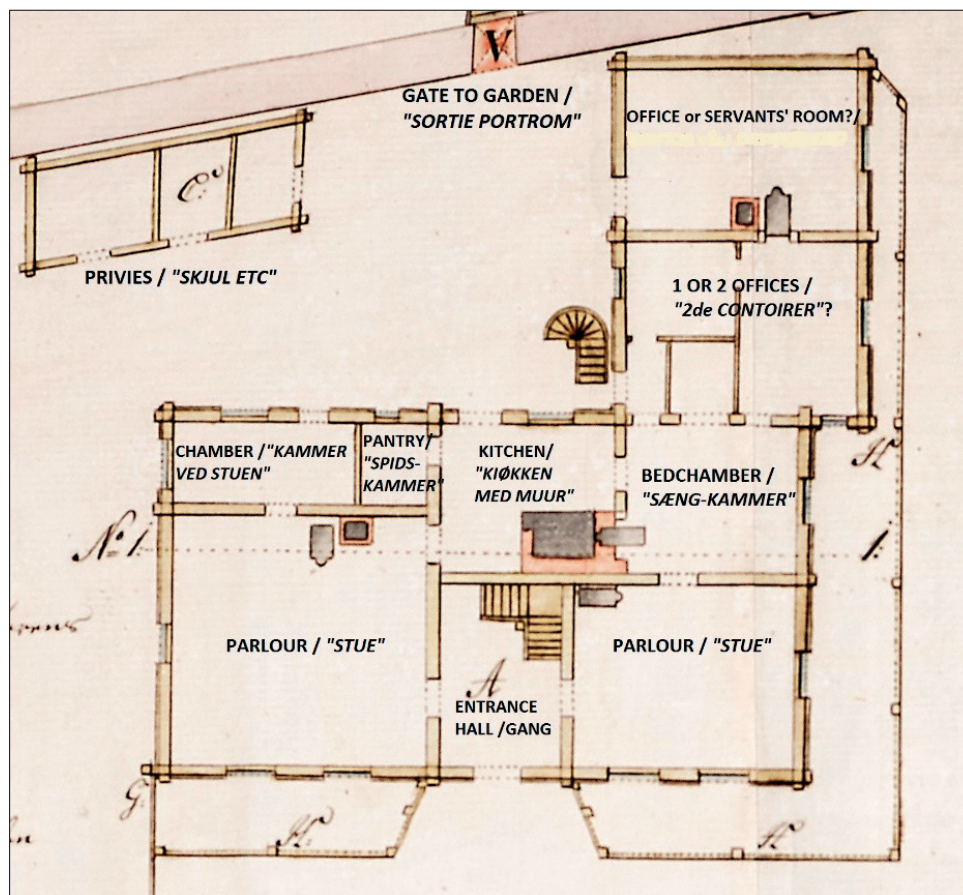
An interpretation of the ground-floor rooms (*1. etasje*) shown on Eckleff's plan of the manager's dwelling house based on the 1766 fire-insurance survey. North to bottom.¹²⁸¹
